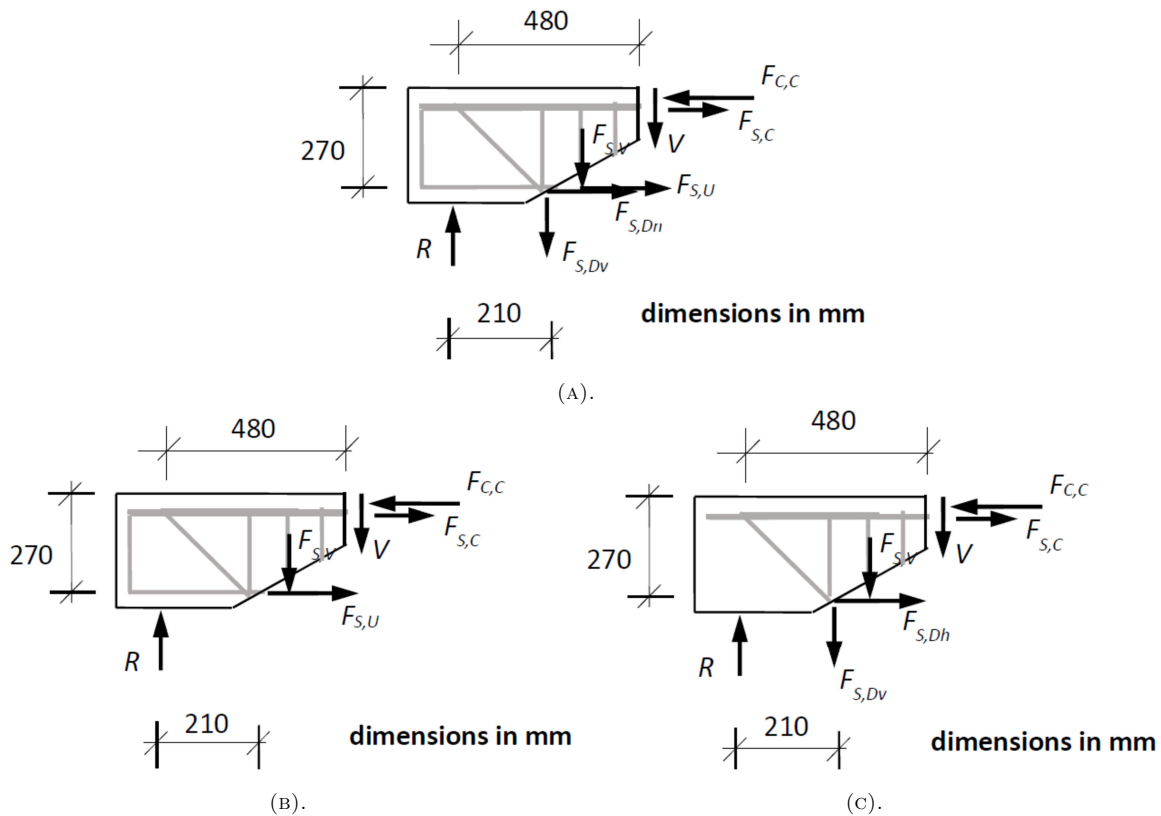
Internal forces in cross section including diagonal crack at re-entrant corner of beam (A) NS-REF, (B) NS-ND, and (C) NS-NU.
